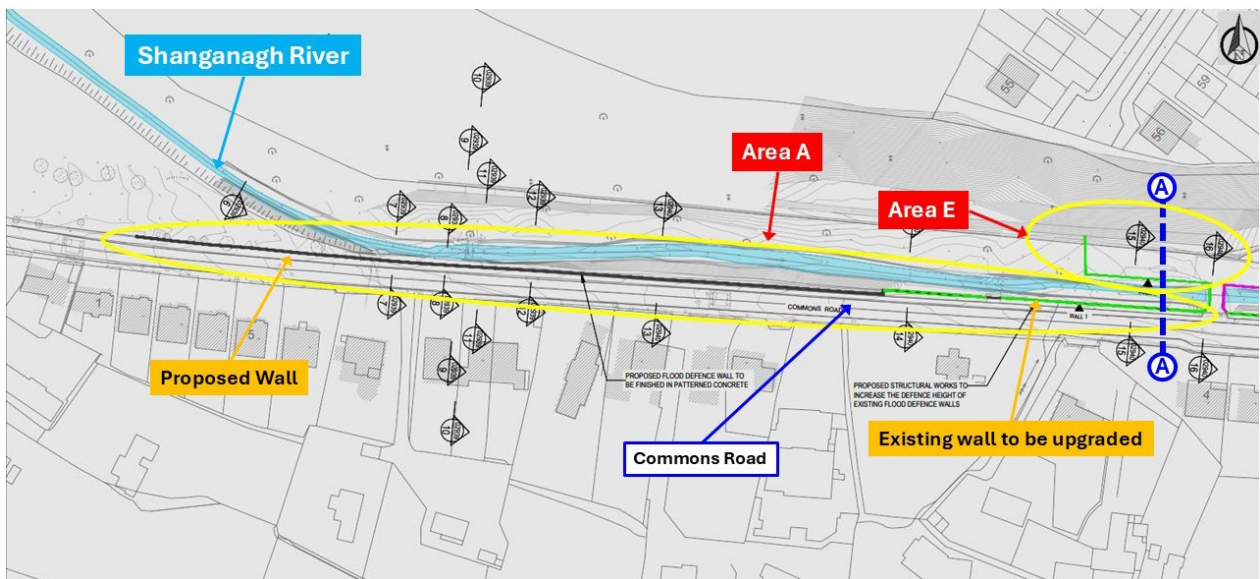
Section of Proposed Works at Commons Road Site (Part 1 of 2)
